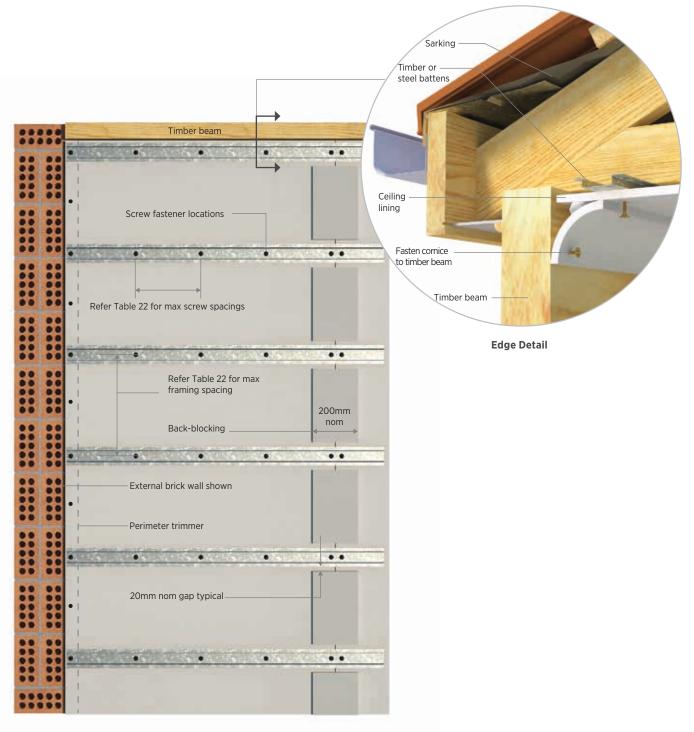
External Ceiling Fixing Layout (1200mm wide plasterboard sheets)
